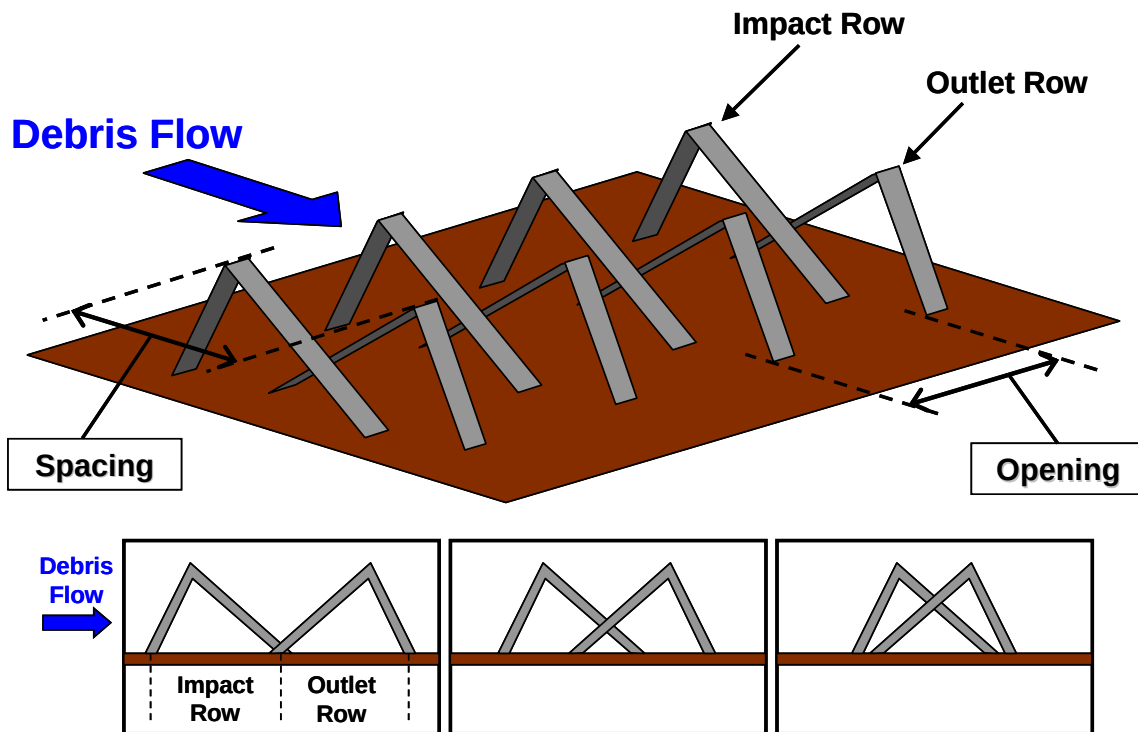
Schematic example of crossing-truss dam configuration (modified from Wu and Chang, 2003).
